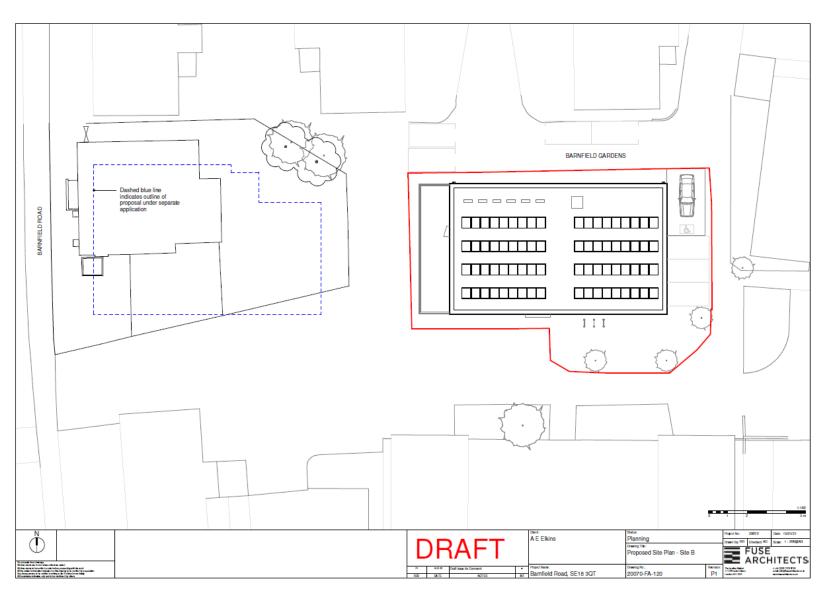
Site B Proposed site plan (Reproduced by courtesy of the client)
